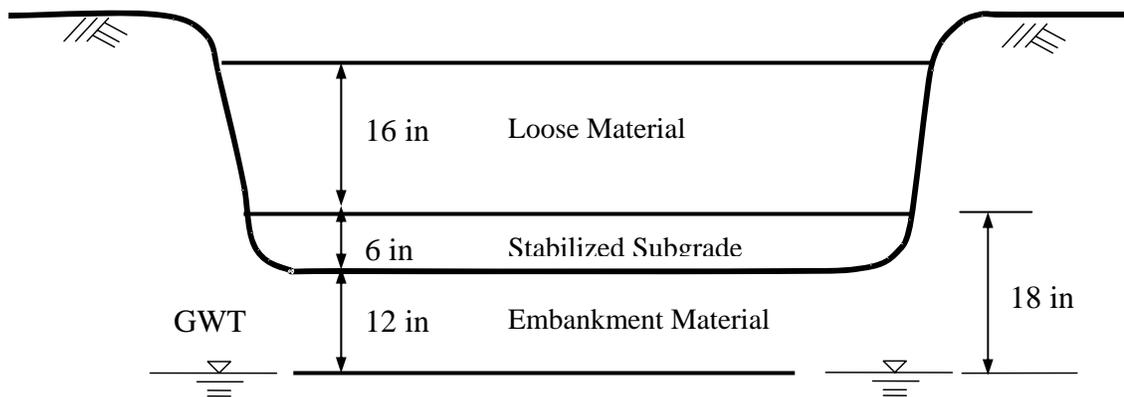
Schematic Site Plan for Compaction of Case A2 (Lake Worth Site)
